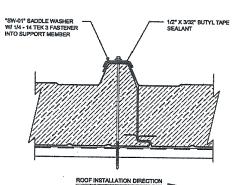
SR ROOF PANEL JOINT WITH FASTENERS
